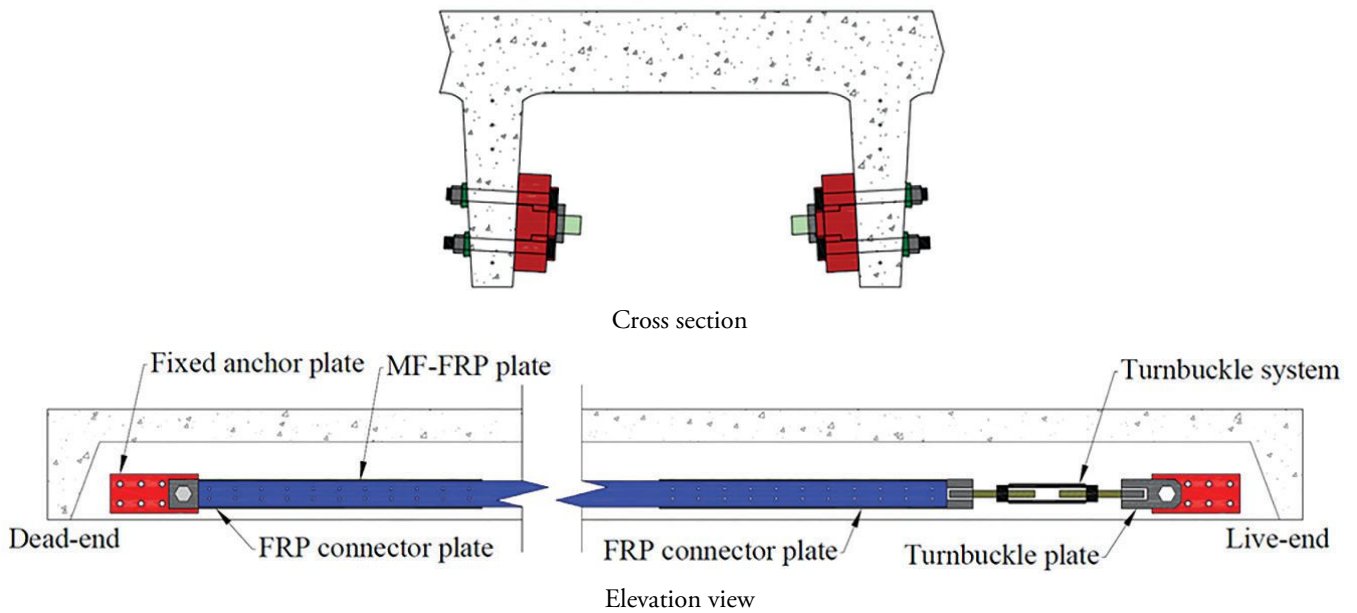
Schematic elevation and cross section of the prestressed, mechanically fastened, fiber-reinforced-polymer rapid-repair system installed on a C-channel beam.
